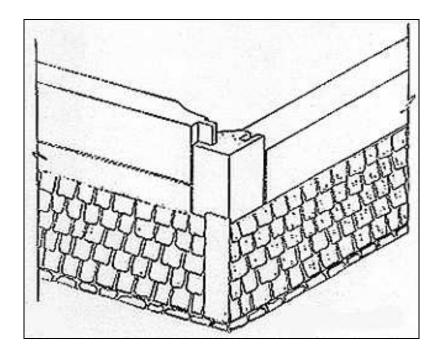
Pièce-sur-pièce en coulisse wall with bardeau (Doucet 1980: 13).
